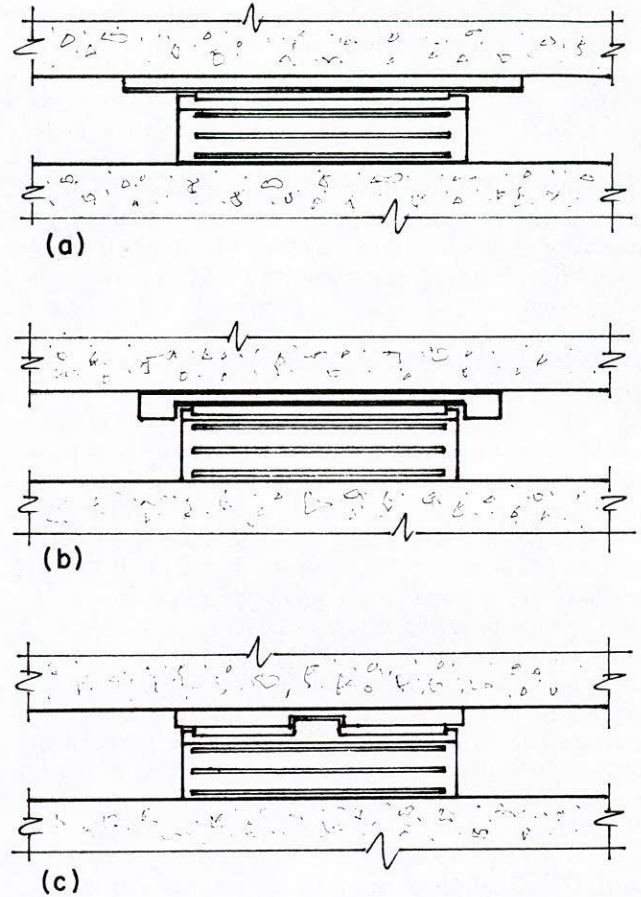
Elastomeric bearings with PTFE sliders: (a) unguided sliding bearing, (b) externally guided sliding bearing, and (c) internally guided sliding bearing.
